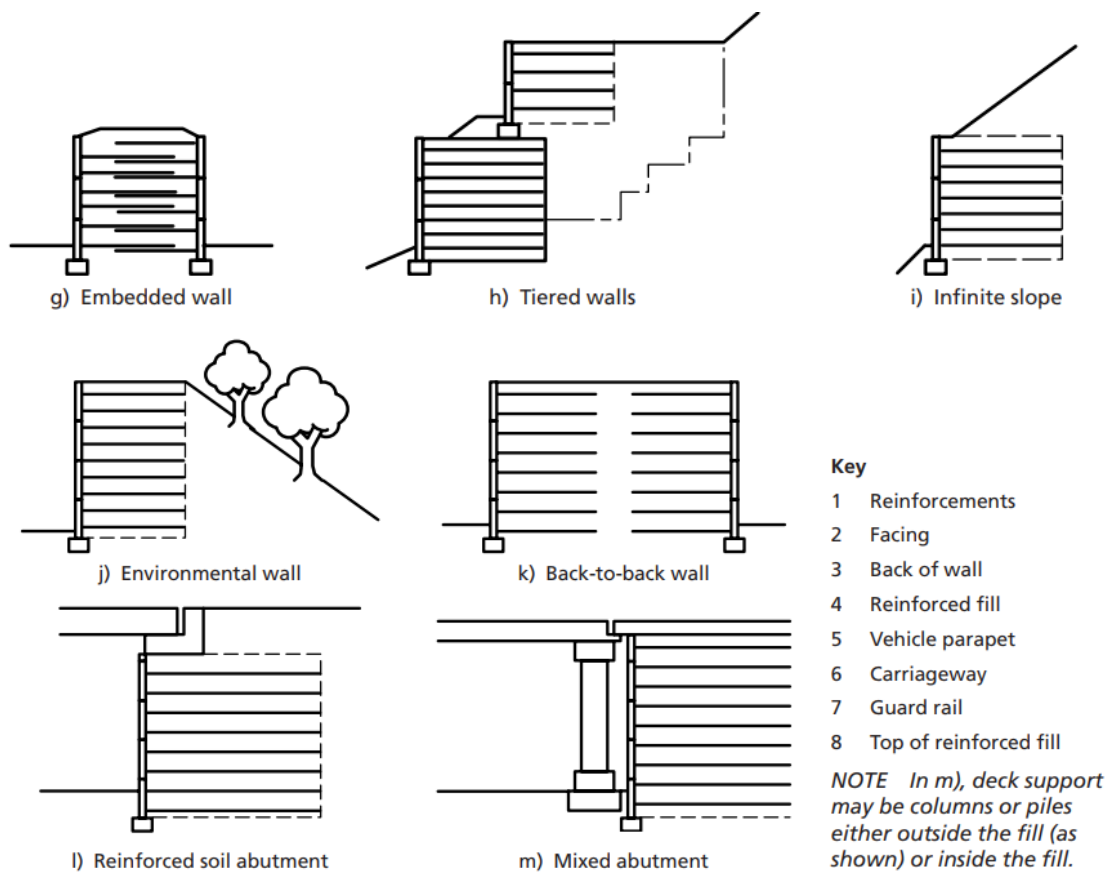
Type of reinforced soil walls and abutments (source: BS 8006-1 2010).
